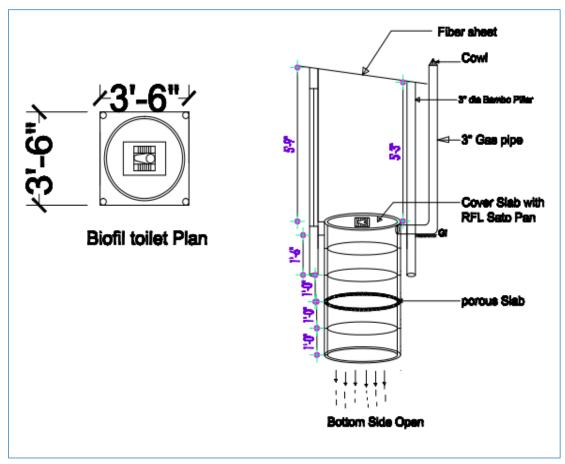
Plan and sectional view of Type-2 Biofil toilet
